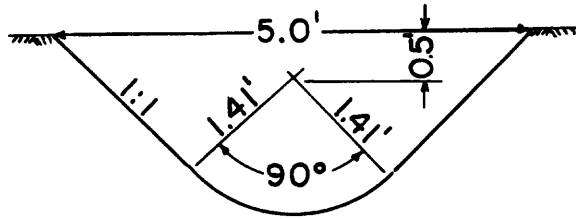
Section of hand placed concrete lined canal with reinforcing, Hidalgo County Water Control & Improvement District number six
